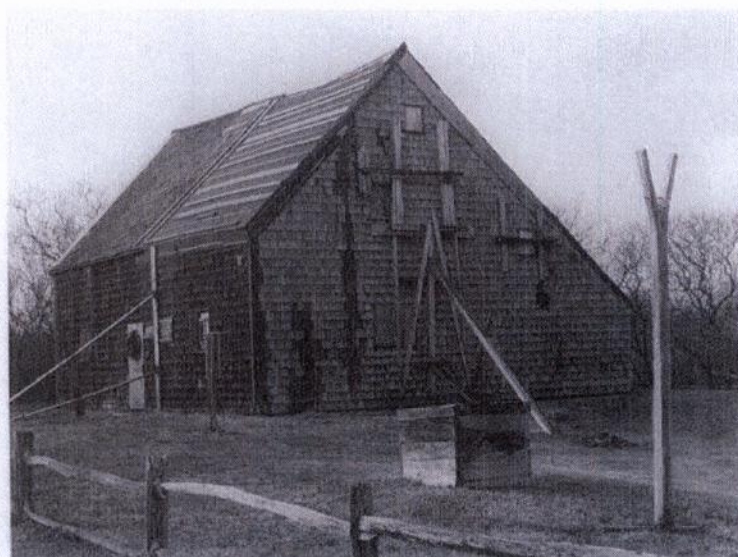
Buildings seriously damaged by storms or deterioration may need to be braced before architectural evaluations can be made. Jethro Coffin House. Photo: John Milner Architects.
